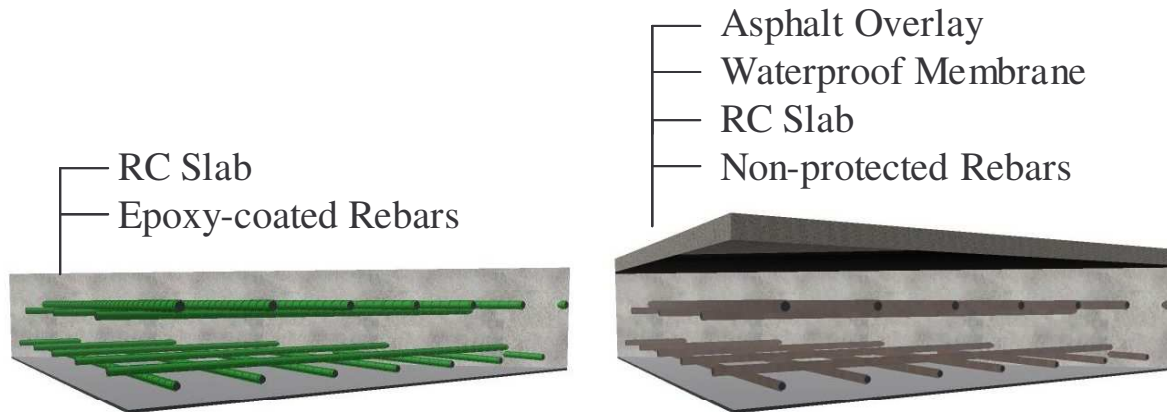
Scheme of Bridge Deck with Epoxy-coated Reinforcement in U.S. (left) and Deck with Asphalt Overlay on Top of Waterproof Barrier in Europe (right).
